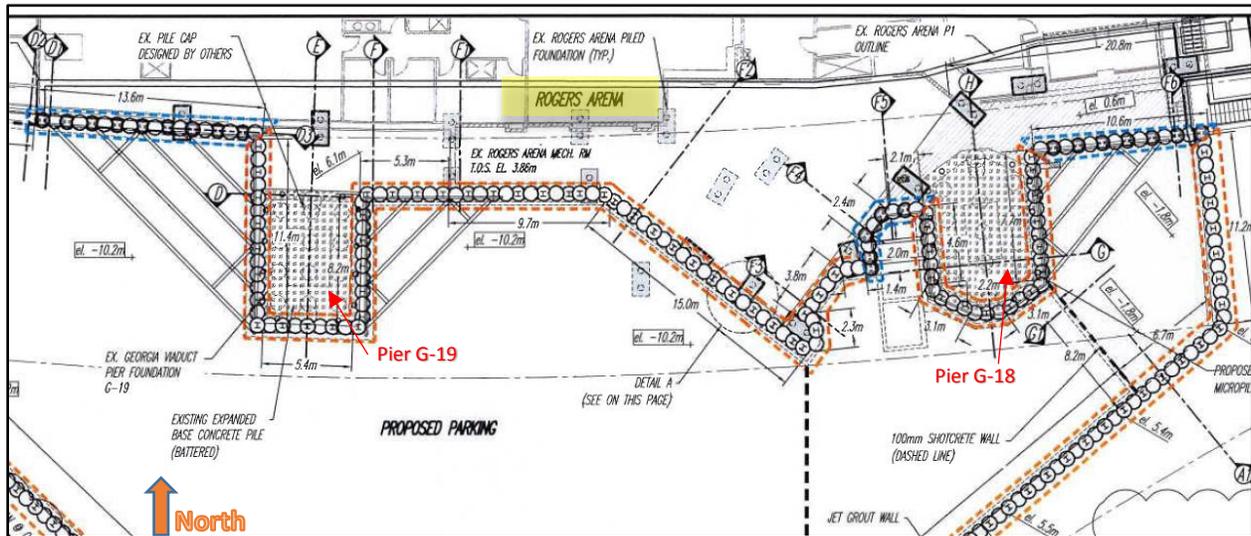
Partial site plan showing the viaduct pilecaps and Roger Arena in the vicinity of shoring area (GeoPacific's Drawing)
